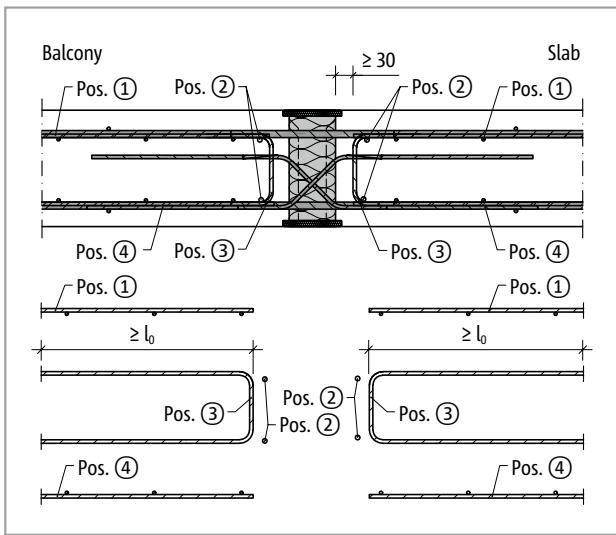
Schöck Isokorb® T type D: On-site reinforcement
